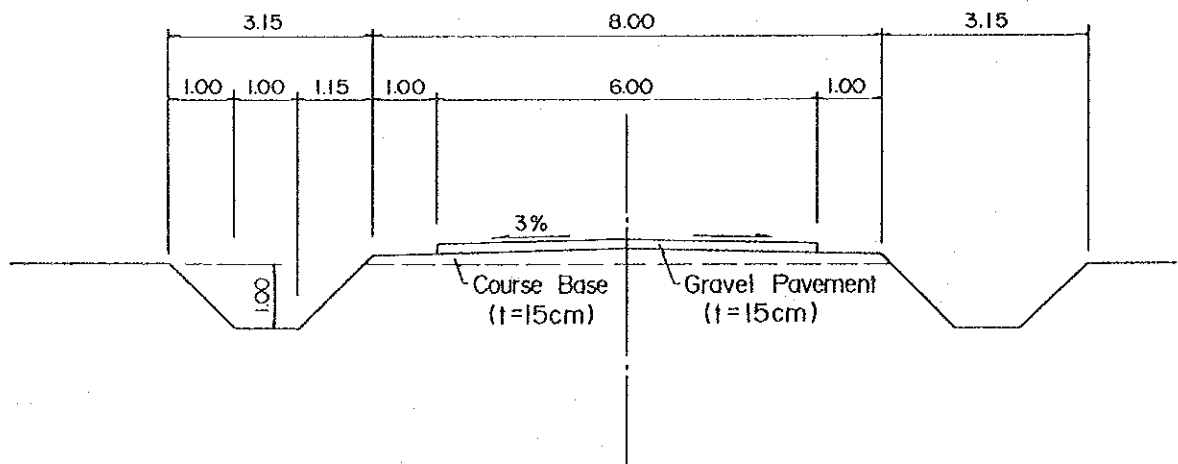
Proposed Cross Section of Trunk Road
